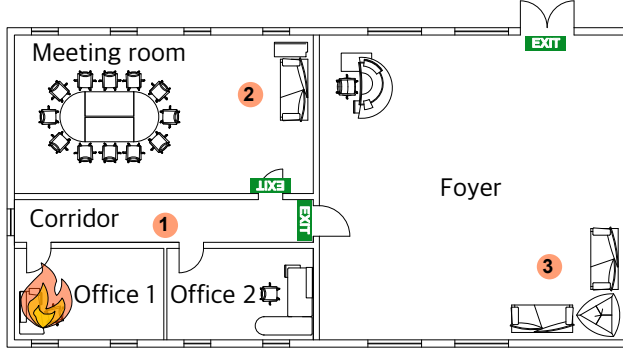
Floor plan of the office facility with dimensions of approximately 20 m × 10 m. All rooms have a ceiling height of 3 m, and the foyer has a ceiling height of 4 m. The design fire is located in Office 1. Exit signs are located in the meeting room, corridor, and foyer as marked with orientation facing inside the respective rooms. Locations 1 – 3 (red circles) denote exemplary sampling points that are considered for a study on grid sensitivity.
